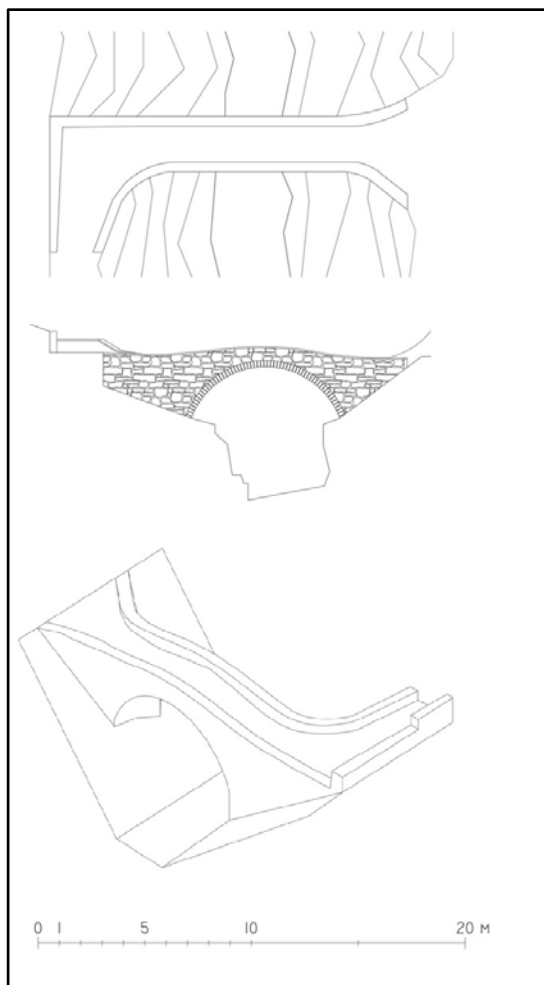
Plan, front elevation and axonometric view of Nonoulo's stone bridge
